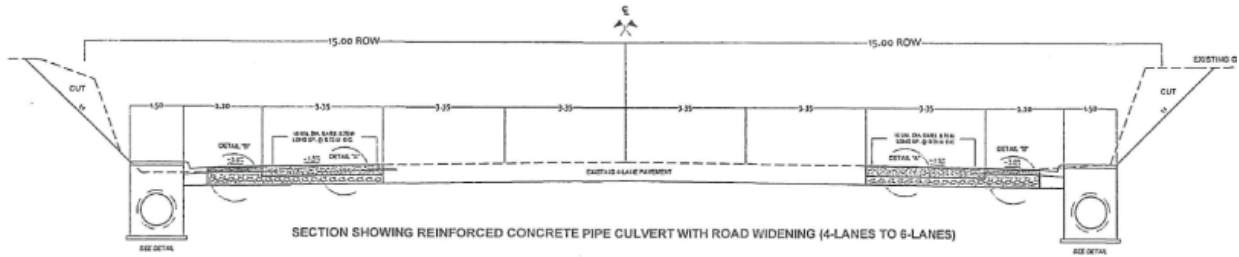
Typical Road Right of Way Section along the New Bypass Road
